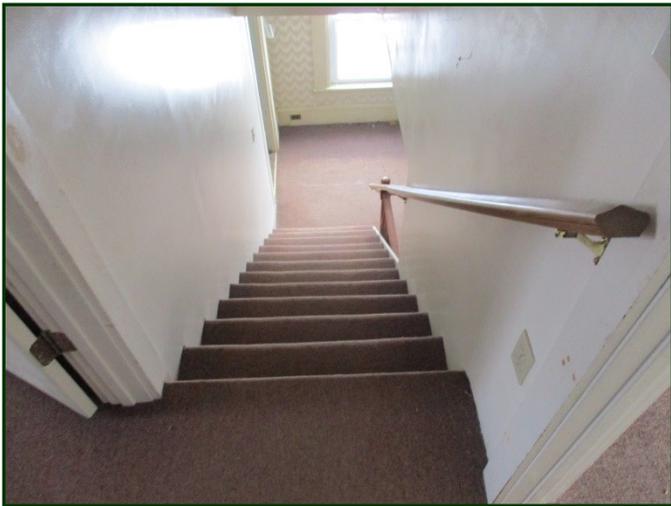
Wooden staircase with carpet and stained wood handrail (viewed from attic level to second floor)
